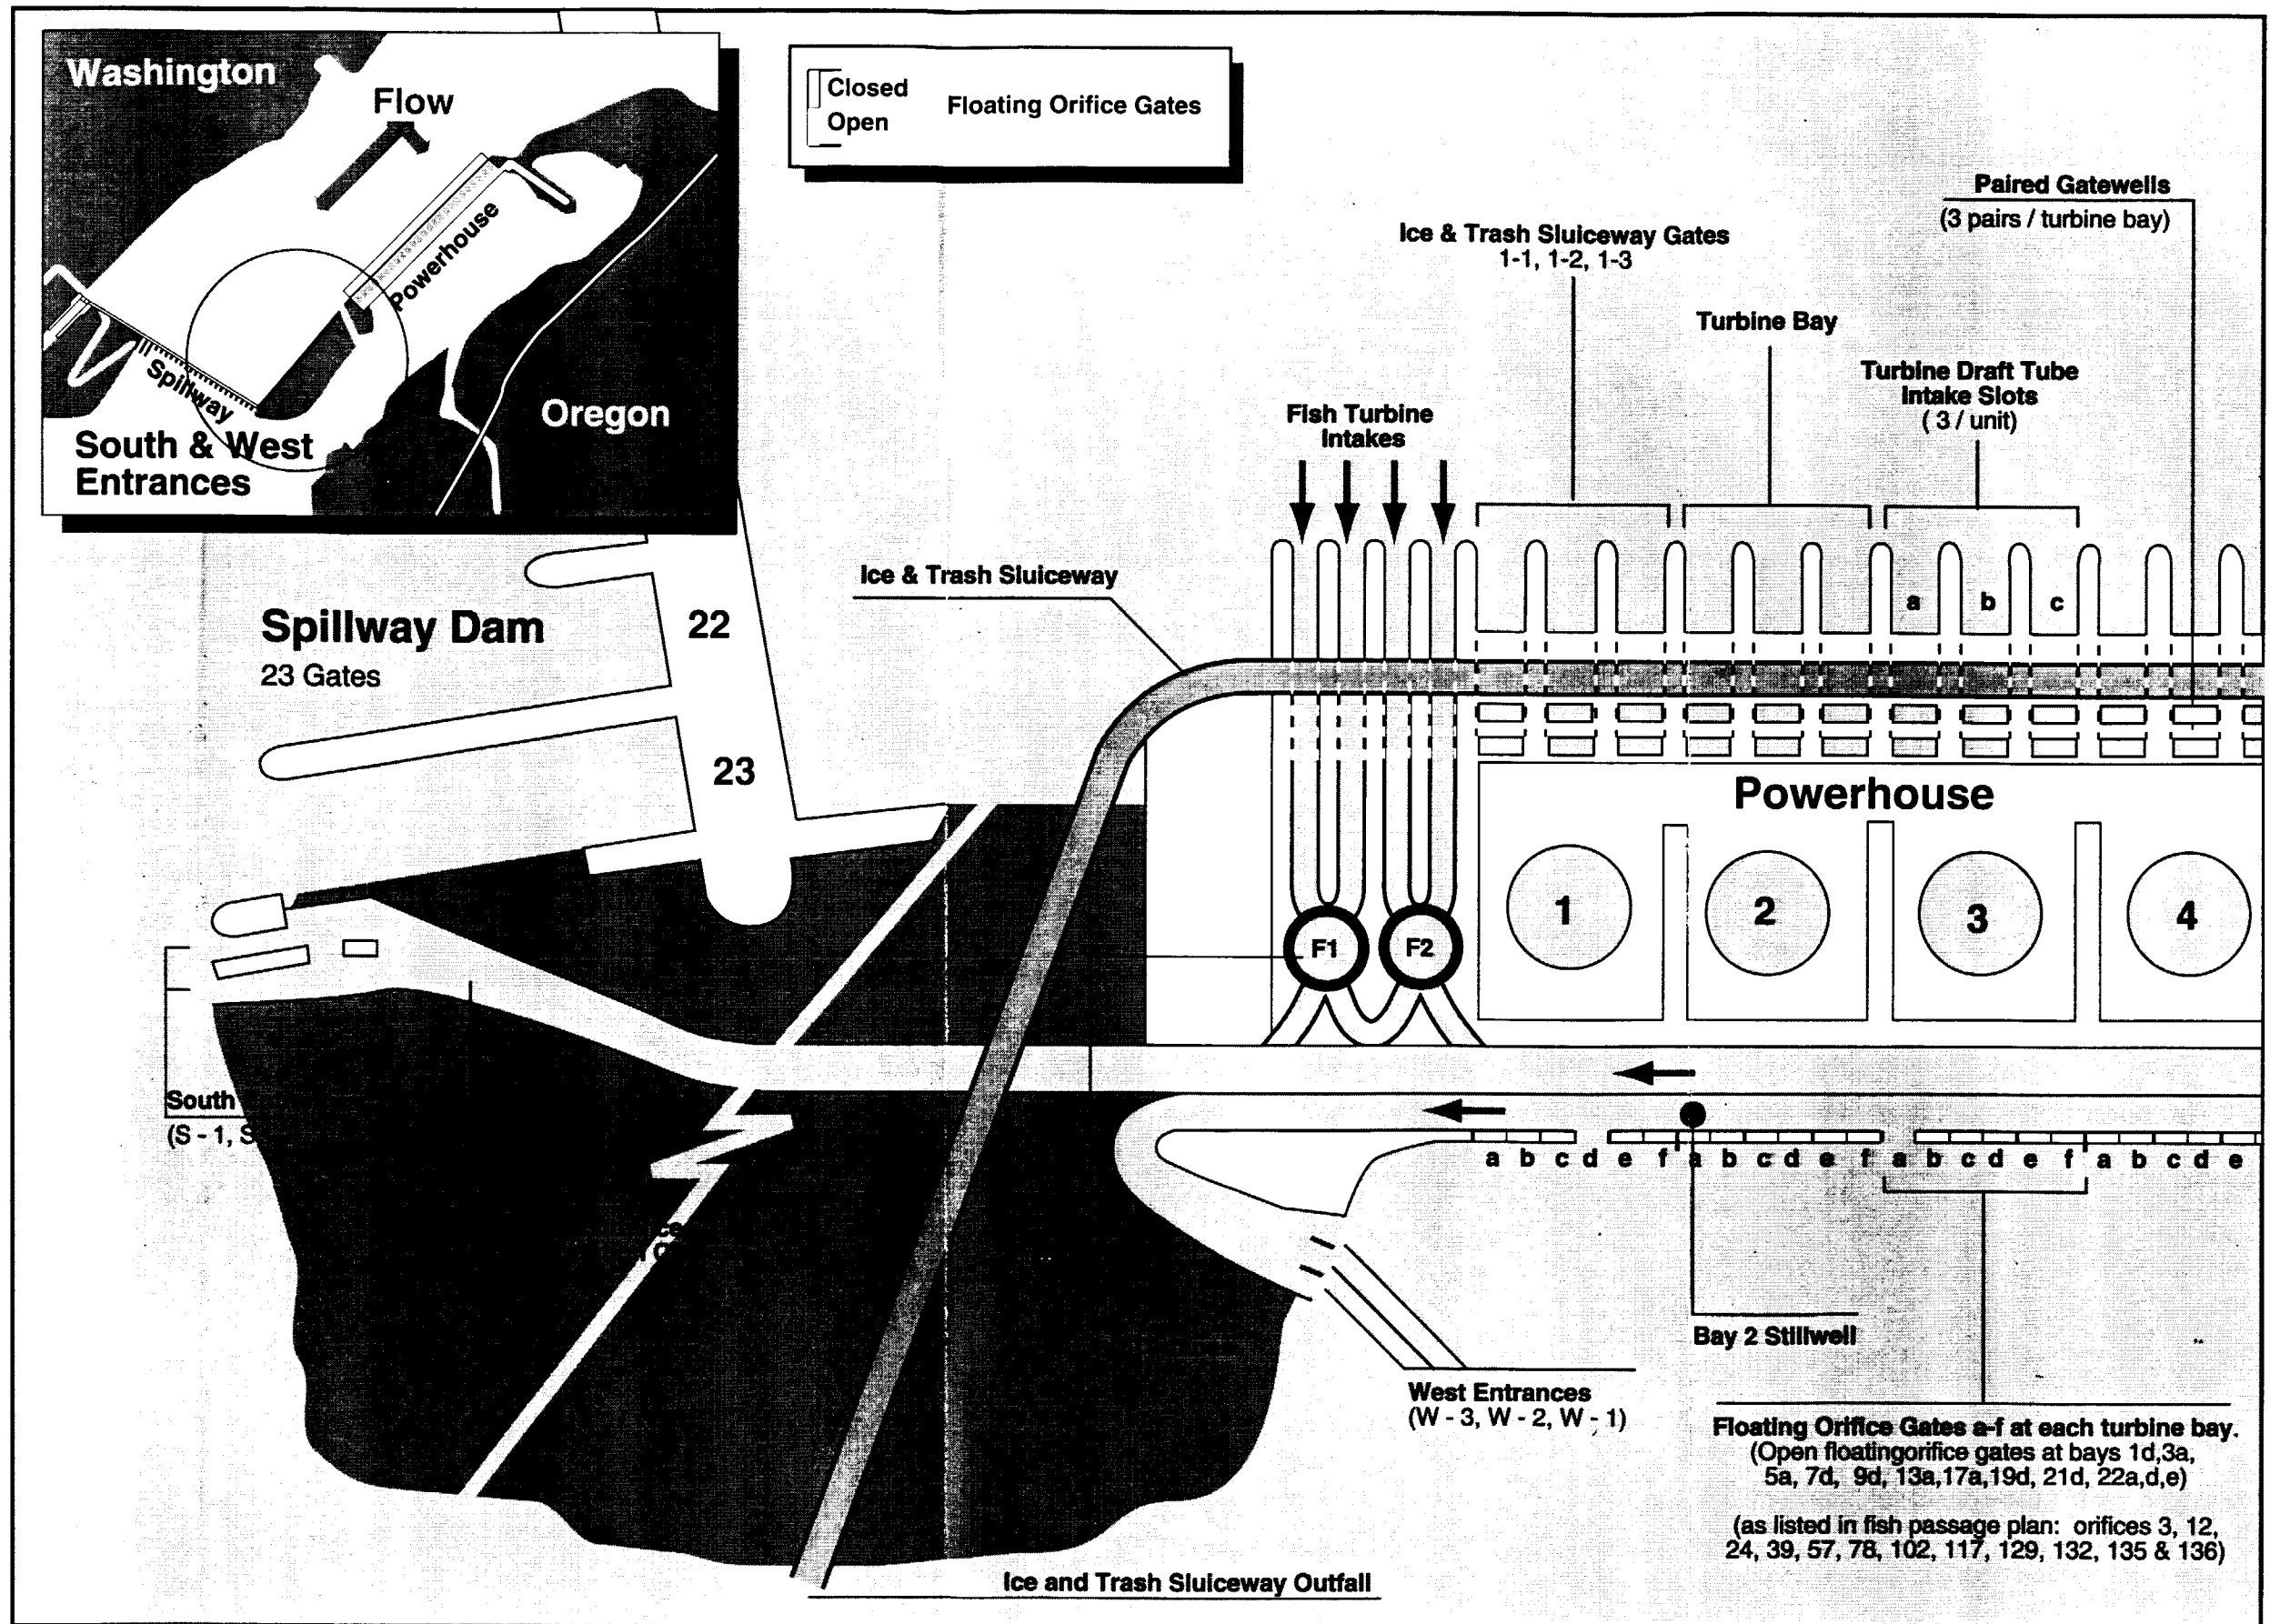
The Dalles Dam South and West Fish Ladder Entrances
